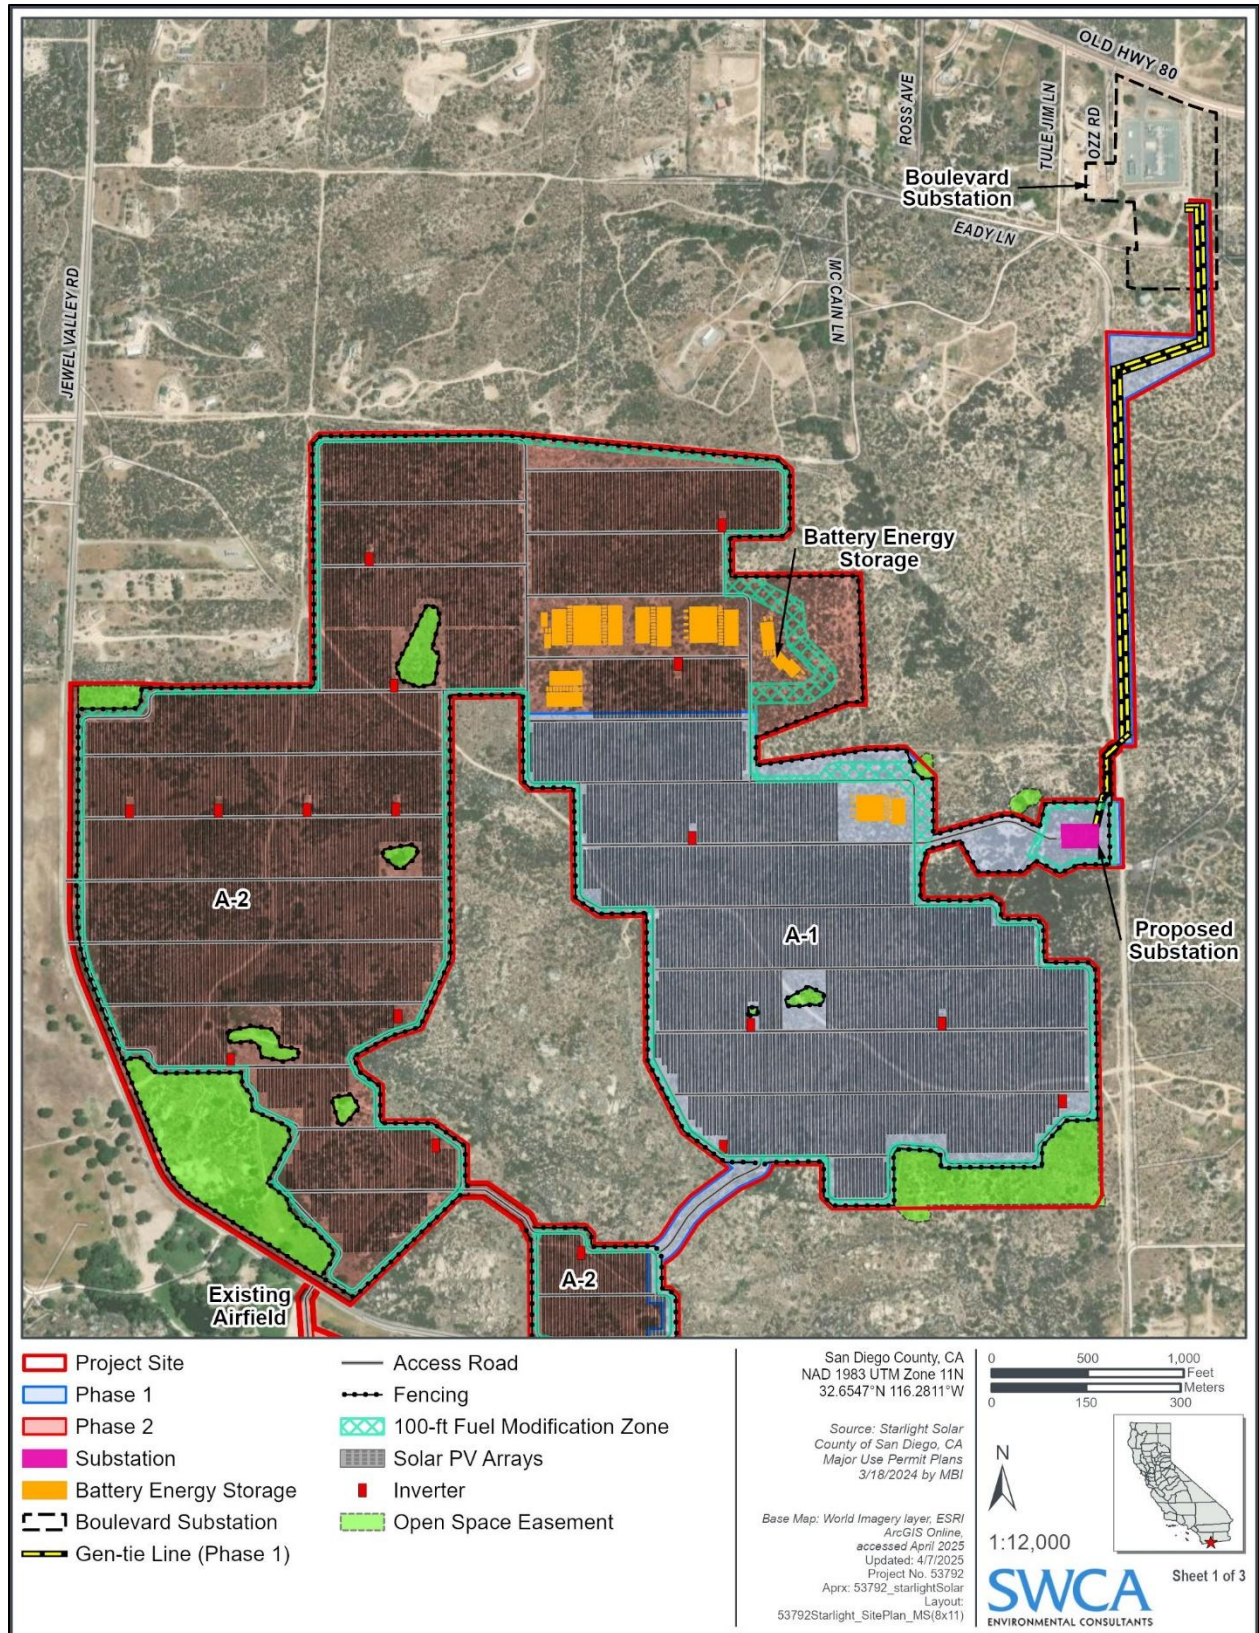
Project Site Plan with Phasing (A1-A2)
